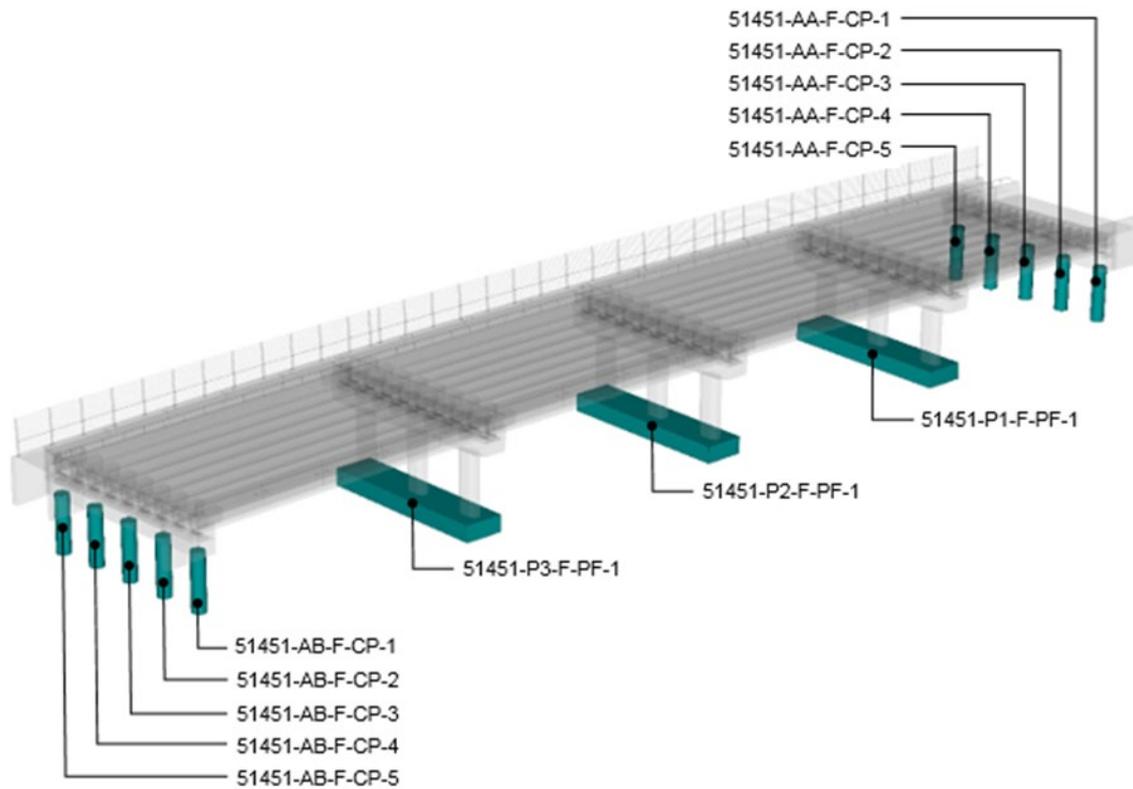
(b) – Object naming convention for piled and pad foundations
